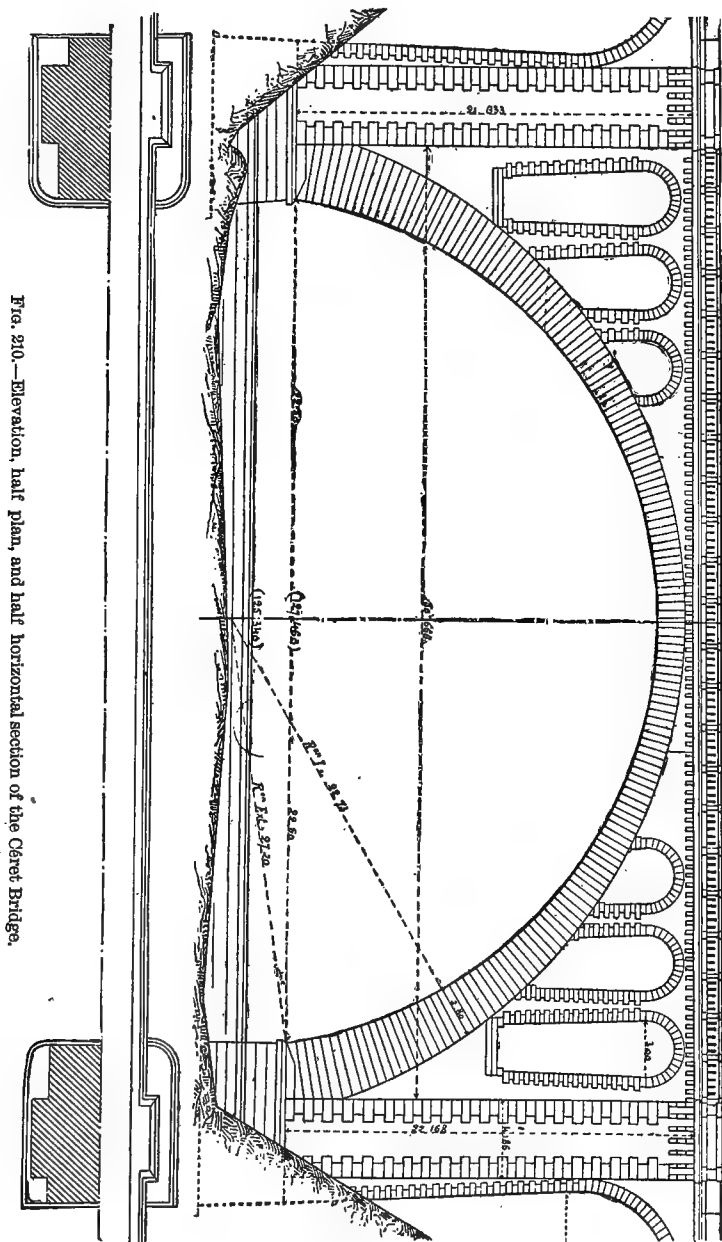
Elevation, half plan, and half horizontal section of the Céret Bridge.
